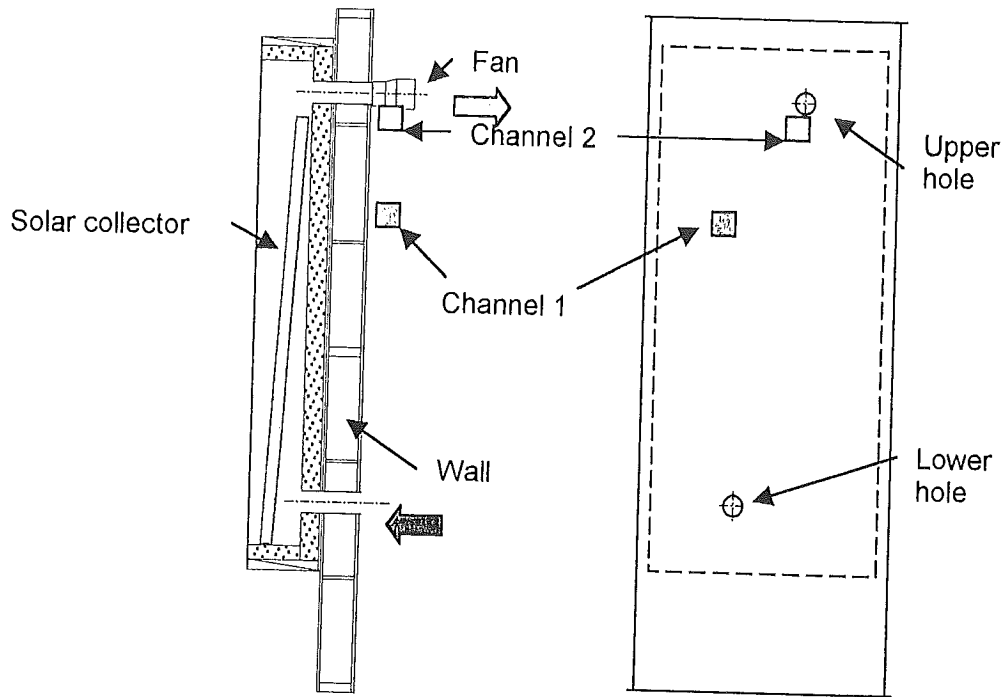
The position of thermometers (Ch.1, Ch.2) set on the inside wall of the buildings.
